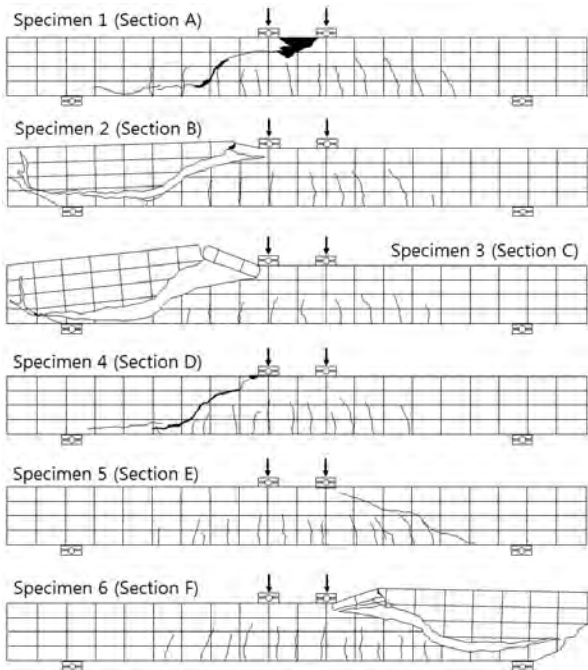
Crack pattern of specimen 1~6 at the end of test
